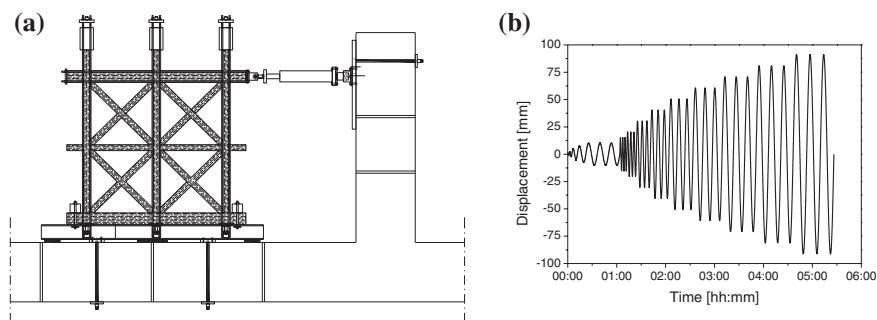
a Test setup used in the experimental campaign; b test procedure
